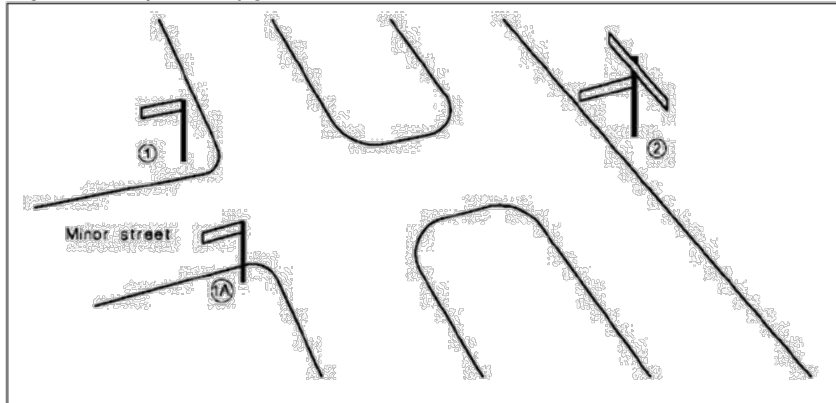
T-JUNCTION—MINOR STREET WITH DIVIDED MAJOR STREET—WITH MEDIAN OPENING
